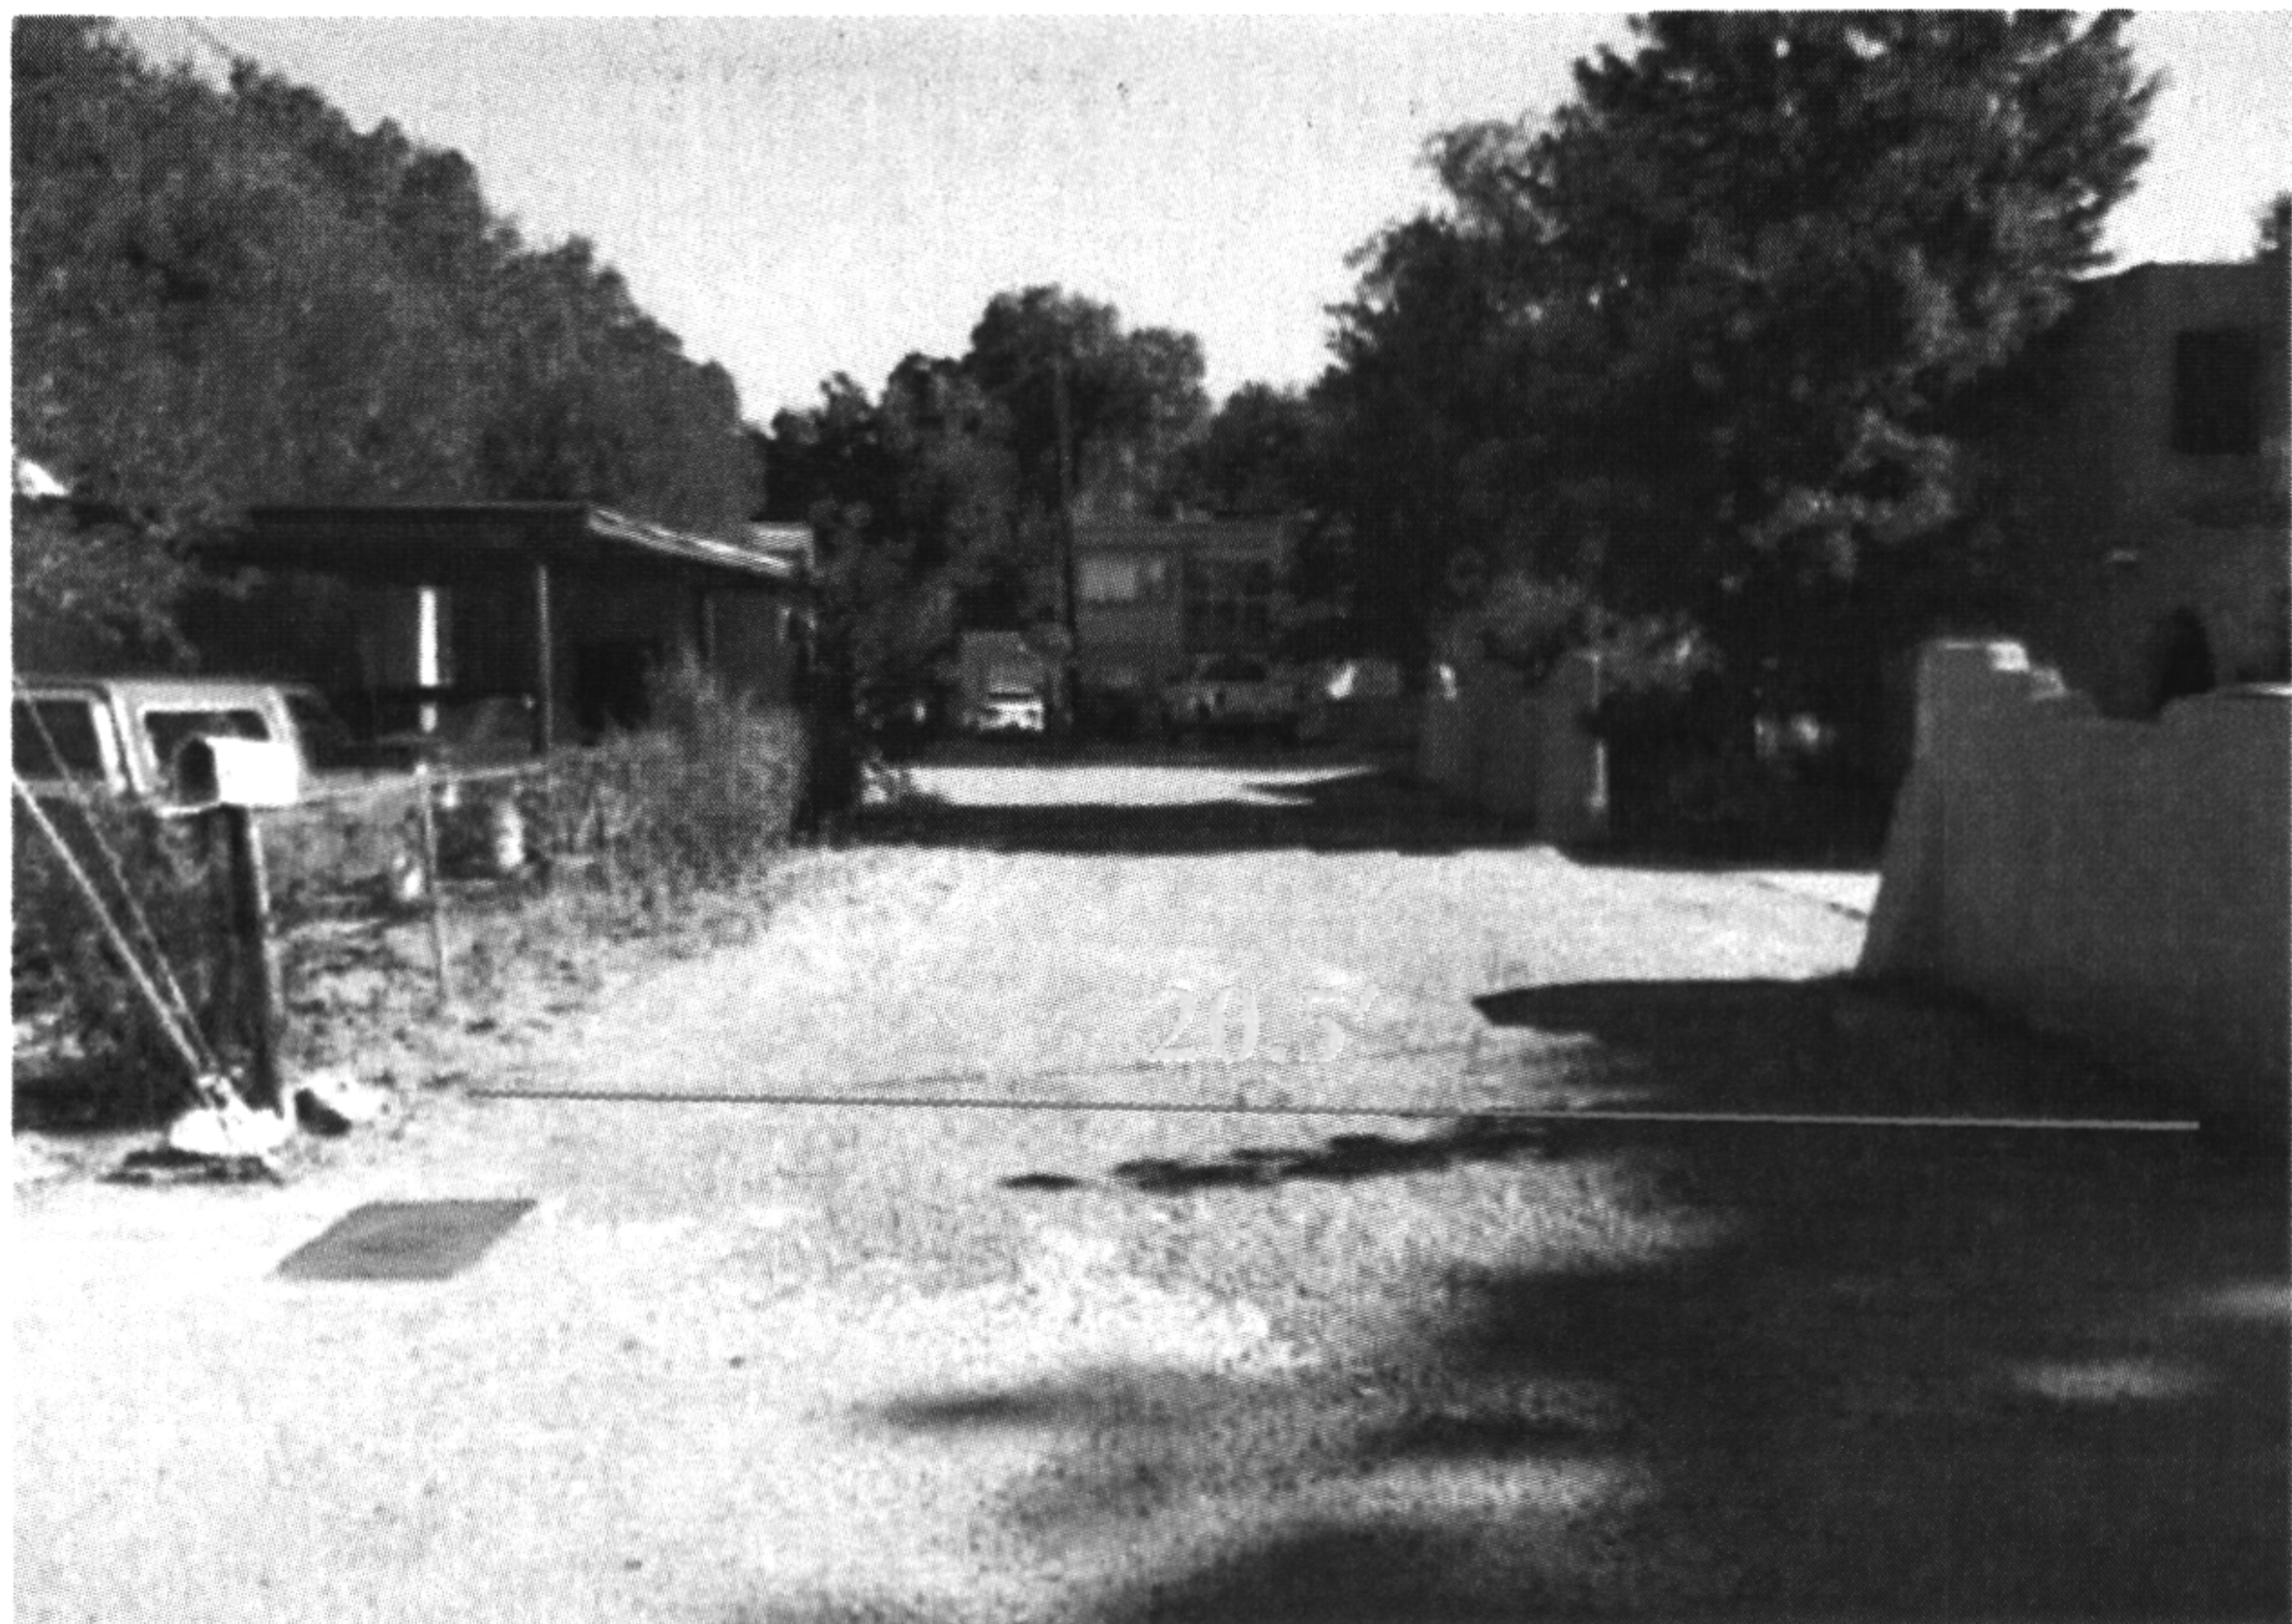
"Privateway" south of Bayita Lane off Guadalupe Trail
